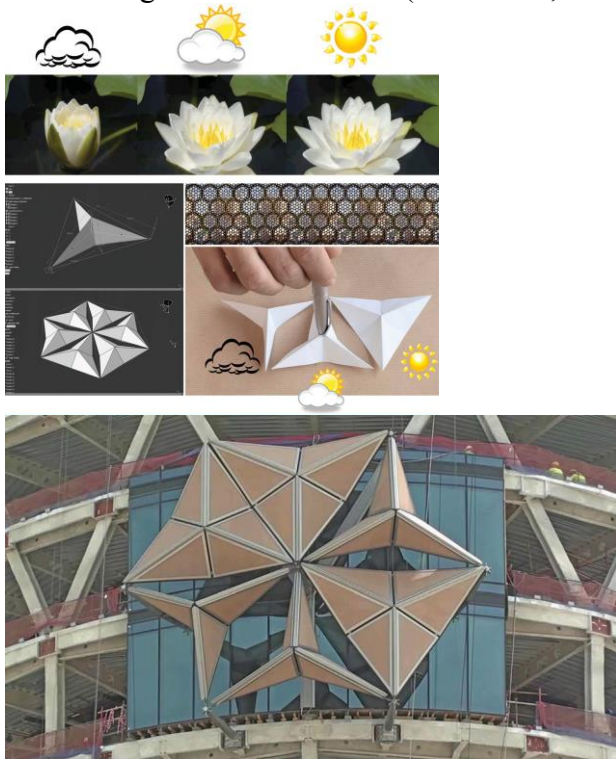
Al Bahr towers and traditional building characteristics in the region
